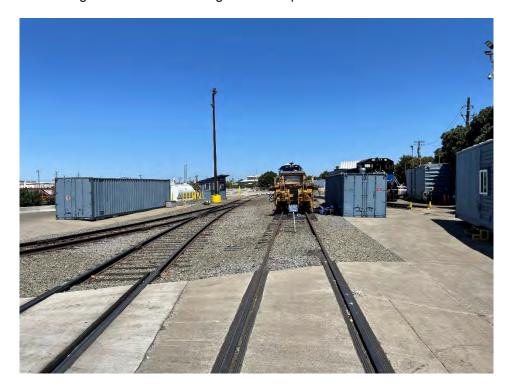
Looking north toward the railroad maintenance area in SW-5. Gravel cover in good condition with no geotextile exposed.
